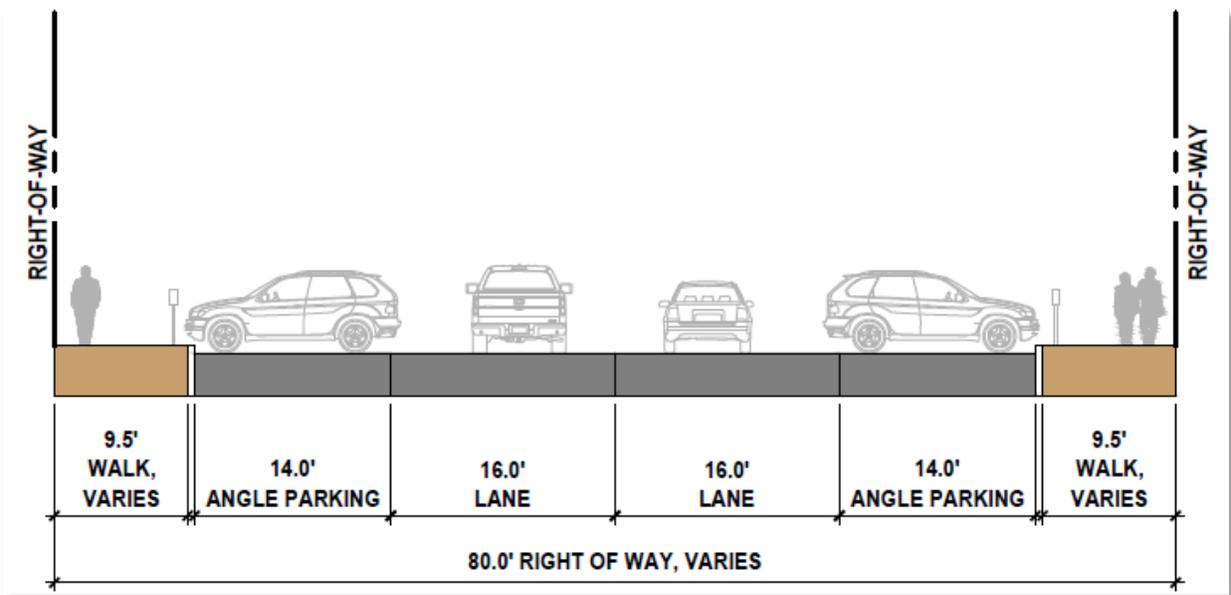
5th St - Existing Cross-Sections Between Colorado Ave & Main St & Main St to Rood Ave
